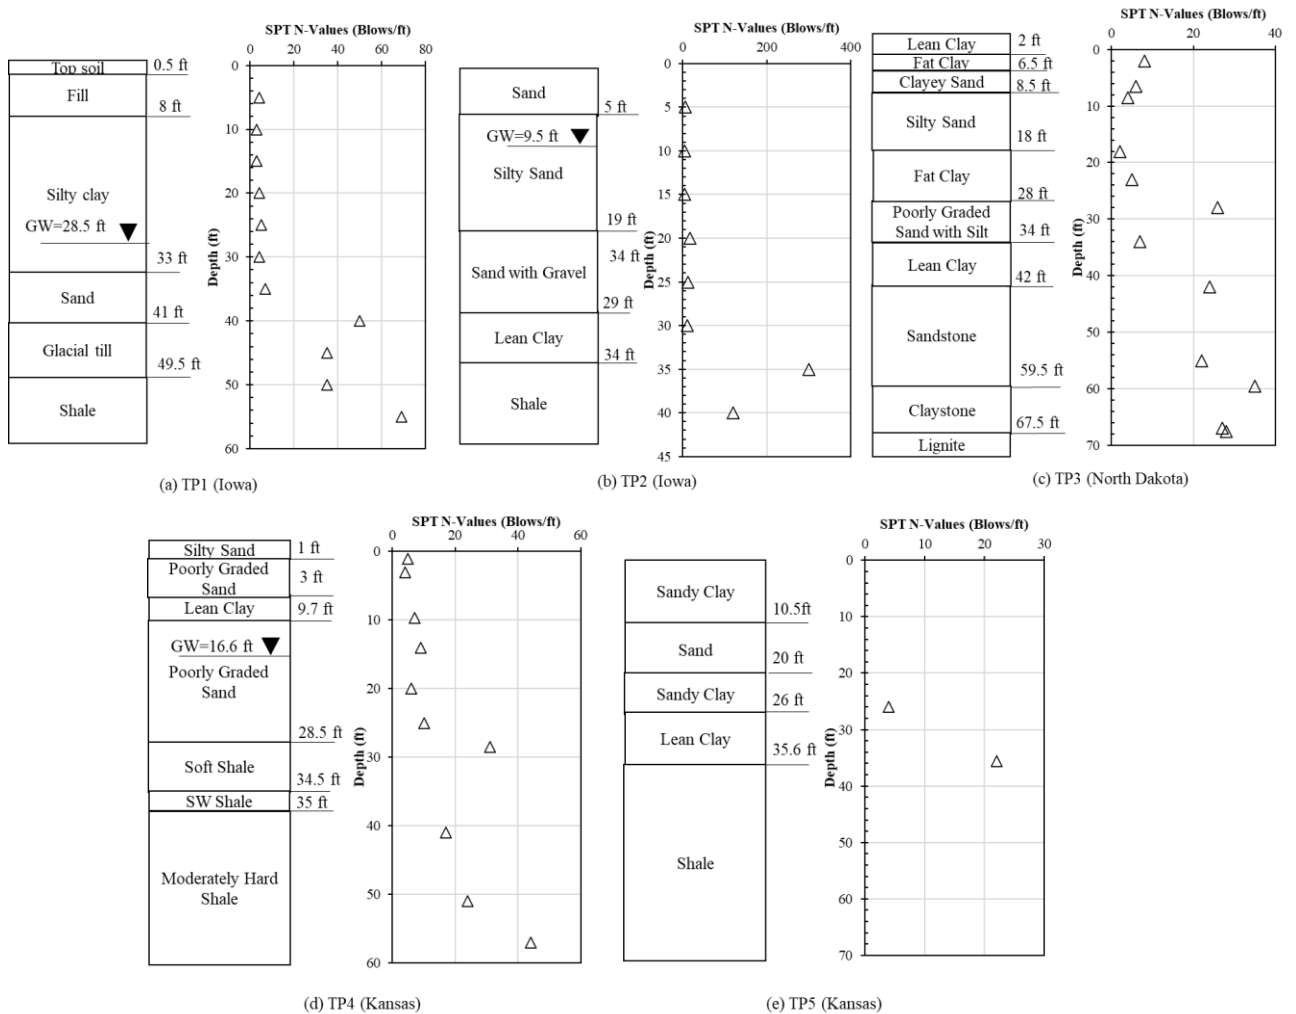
to 3.1k show the groundwater tables, SPT N-values and geotechnical subsurface profiles for the test piles (TP1 to TP11). TP1 is situated 15 ft north of the east abutment of the rebuilt IA Highway 92 bridge over Marvel Creek. This pile is not a part of the bridge foundation. Shale is located 49.5 ft beneath the soil surface, and the overburdened soil includes 33 ft of silty clay, 8 ft of sand, and 8.5 ft of glacial till (Figure 3.1a). The second test site for TP2 is located on US 63 over the drainage ditch, 0.3 miles south of Ottumwa, in Wapello County, Iowa. A total of six test holes were drilled at the site, and SPT profiles were obtained from each borehole prior to test pile installation. Figure 3.1b shows the SPT blow count and surface profile of the borehole report adjacent to the test pile. The subsurface profile consists of a 5 ft thick sand layer, followed by a 14 ft thick silty sand layer. The gravel is traced from 19 ft to 29 ft below the existing ground. The bedrock or shale layer is encountered 34 feet below the existing ground. The SPT N-values were reported at almost every 5 ft interval, and groundwater is encountered at 9.5 ft below the existing surface. TP3 shown in Figure 3.1c is an HP12×53 pile driven at multiple geomaterials layers, and the groundwater table is not encountered below the existing ground surface. Sandstone, claystone, and lignite bedrock starts at 42 ft, and the overburdened soil consists of 18.5 ft of clay, 9.5 ft of silty sand, and 6 ft poorly graded sand with silt.
